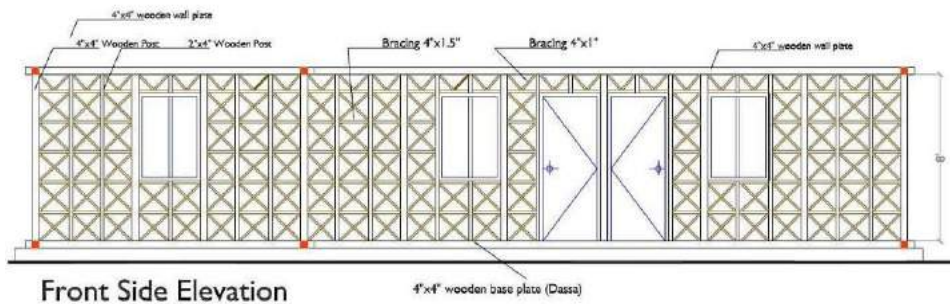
Typical front elevation of an “engineered” dhajji dewari building after the 2005 Pakistan earthquake
